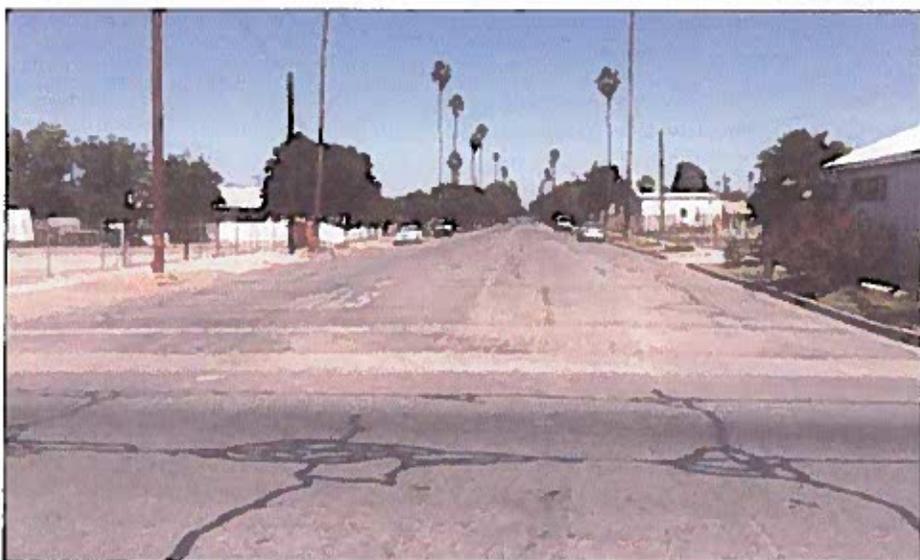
Looking north at Fifth Street and Cedar Avenue
